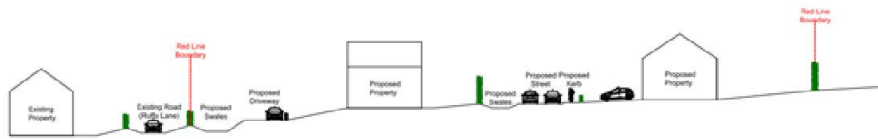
Site Section Plan for the previous outline application 17/00894/MOUT
